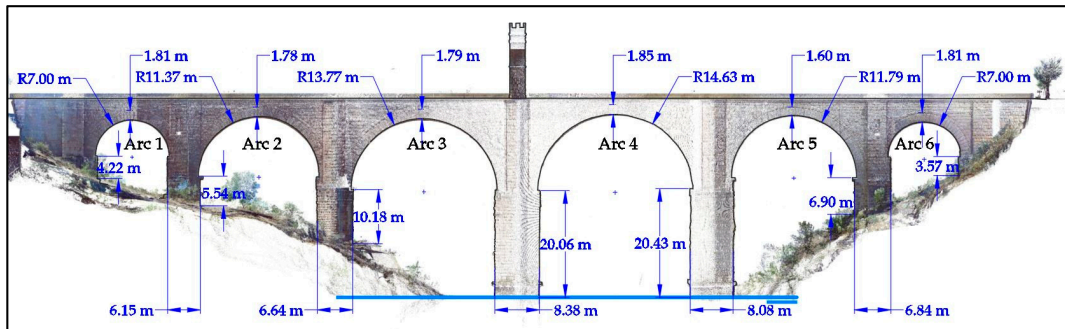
Longitudinal section downstream from the Roman bridge of Alcántara.
